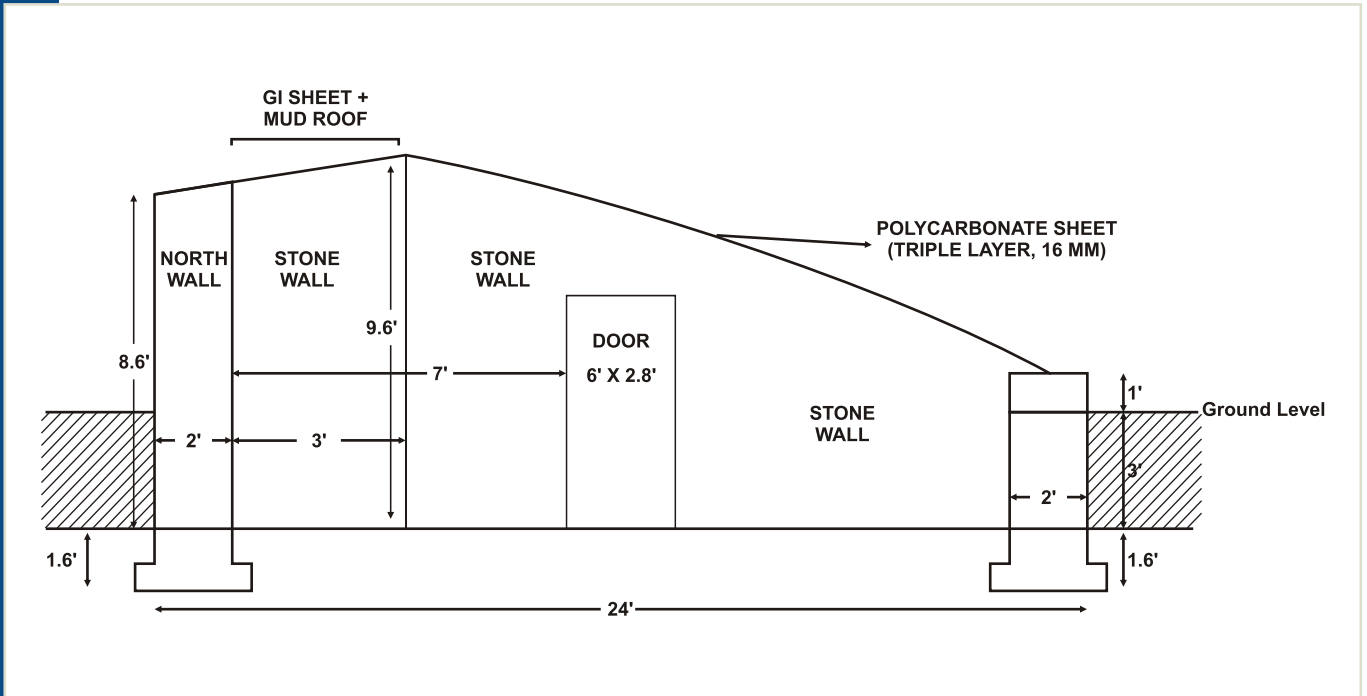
(b): Side view (West) of Medium Type Ladakh Greenhouse (60'×24'; single stone wall)
